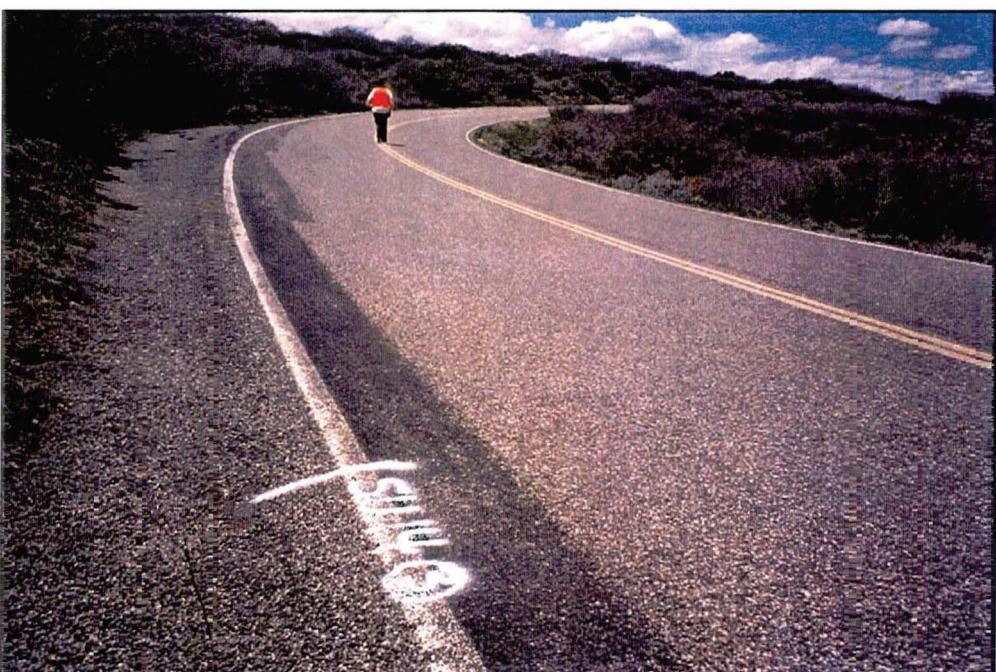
Section 3, Sample Unit 14 (MP 2.32)
